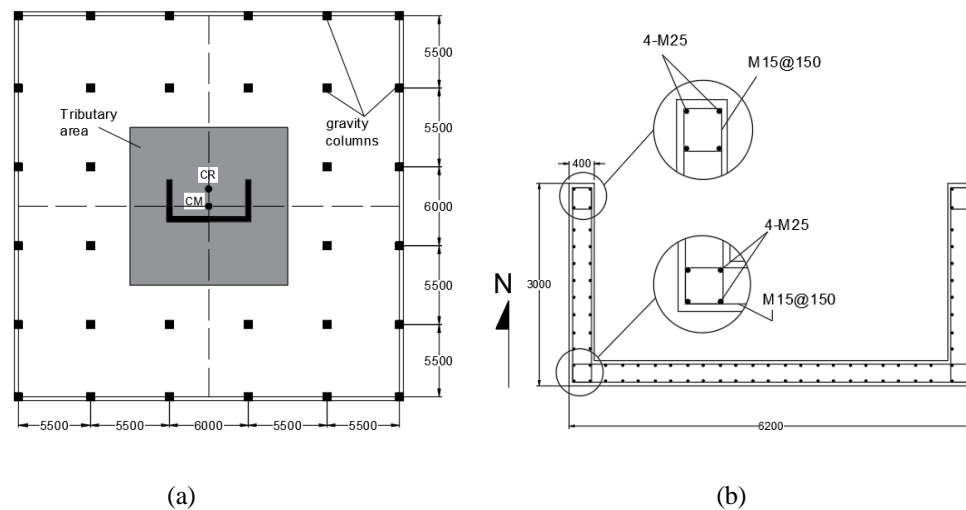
Selected building: (a) building plan view; (b) core wall details
